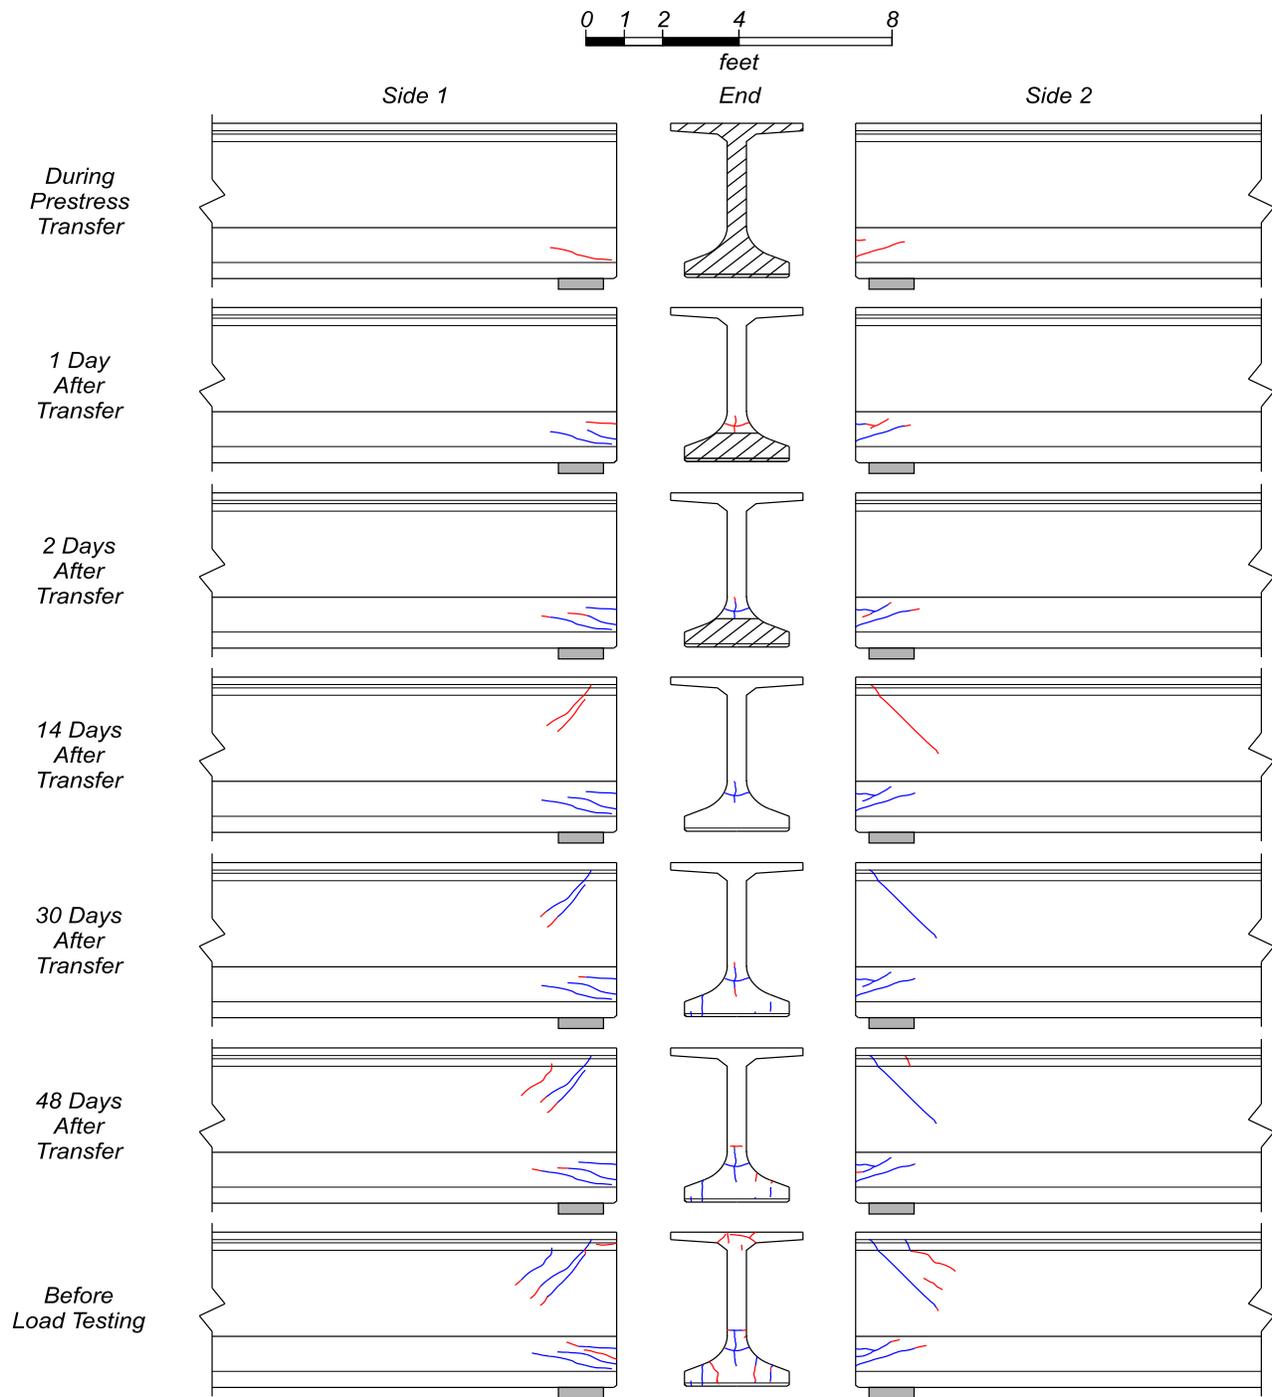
Crack growth in specimen PT (flexural cracks in top flange not shown)
